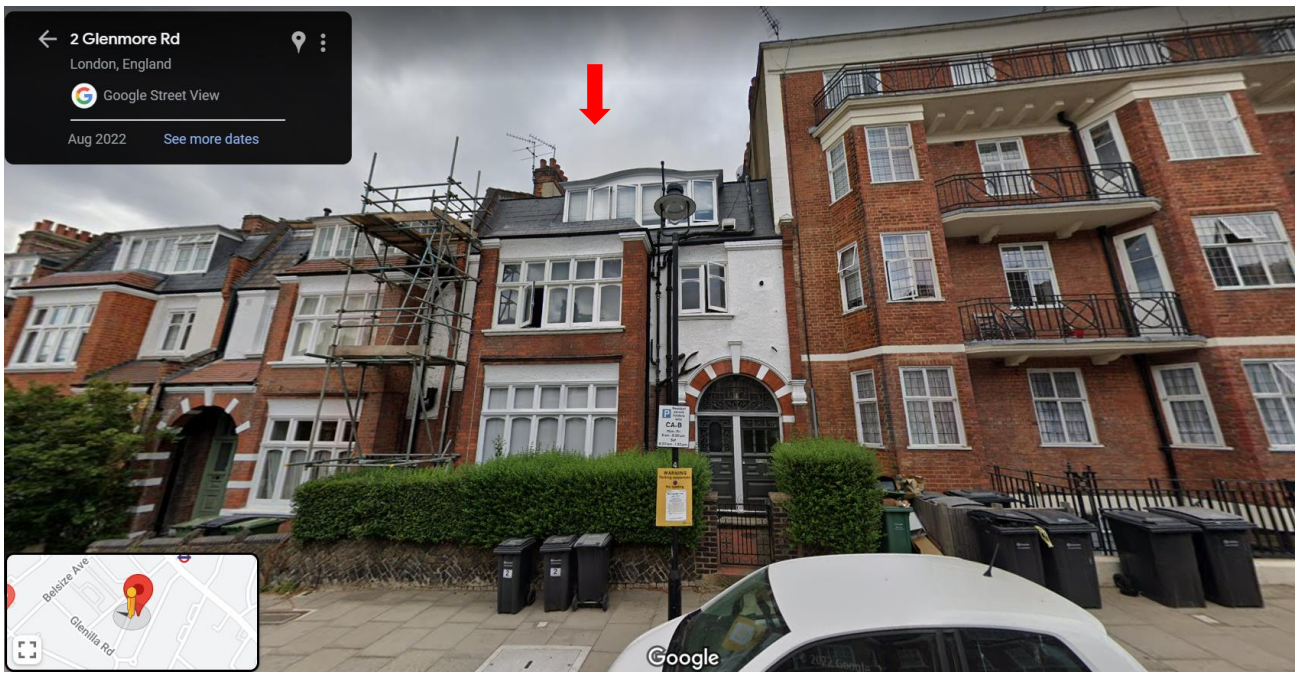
(above): Front façade of property on Glendale Road (source: Google streetview)
